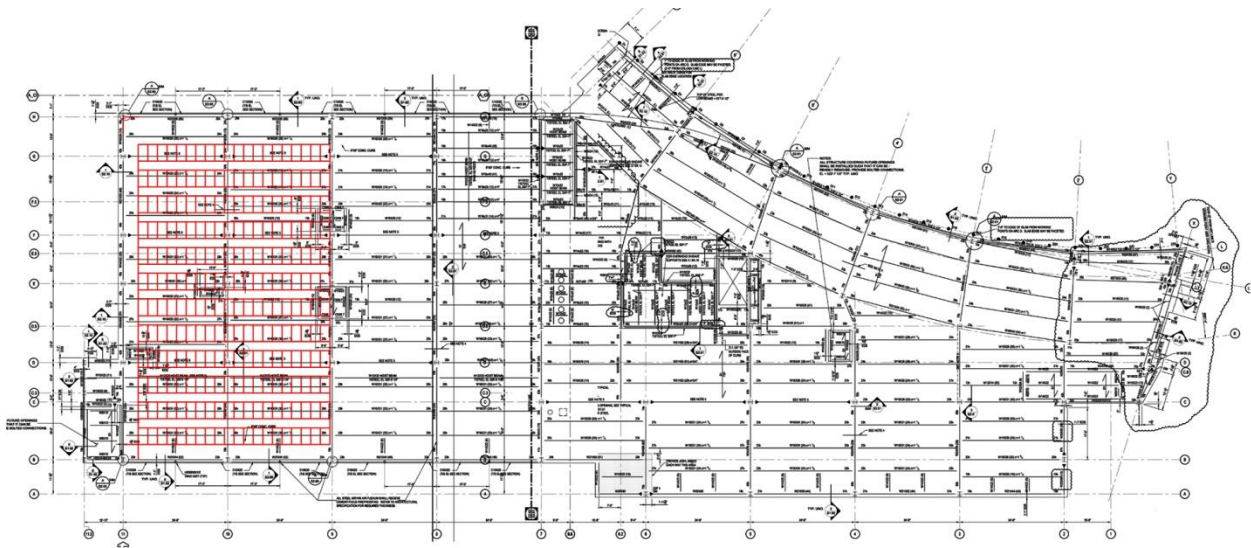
Layout of the PV-Panels on the Roof of the Children's Hospital
